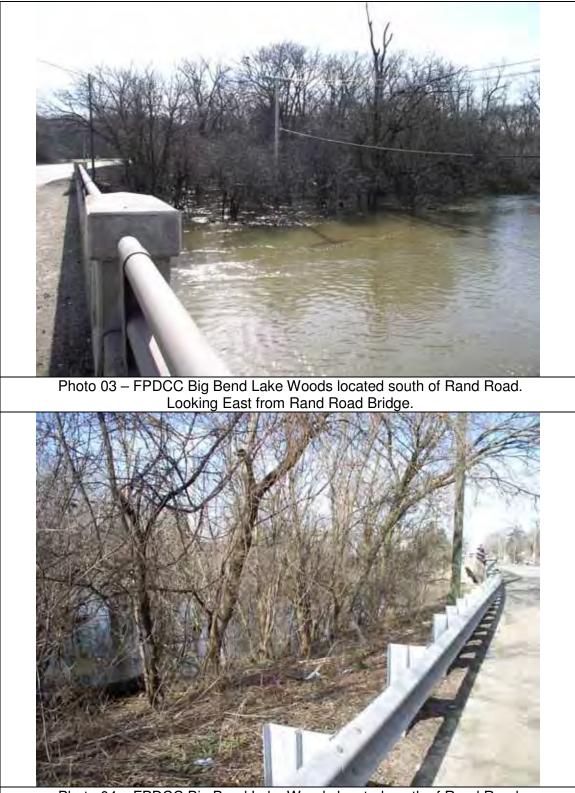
FPDCC Big Bend Lake Woods located south of Rand Road. Looking West to Rand Road Bridge.
